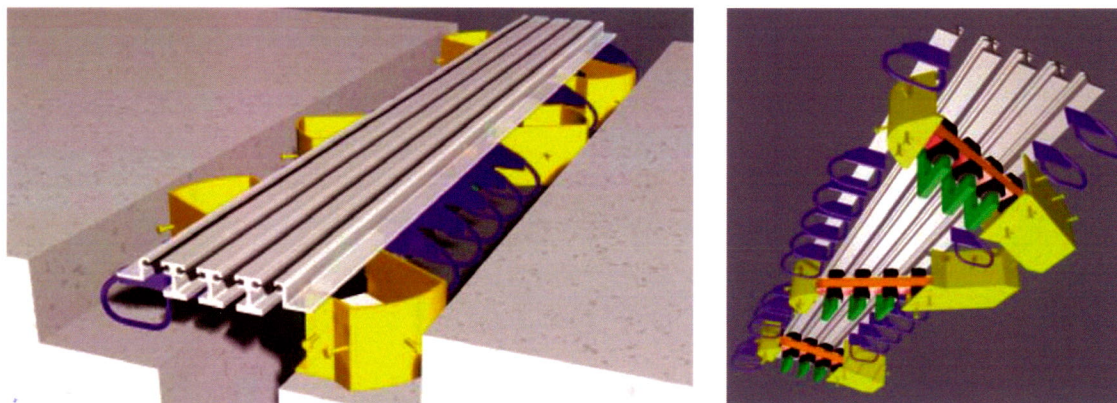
Left: 3D view of the Swivel joint joint; Right: bottom view of the support bars.
